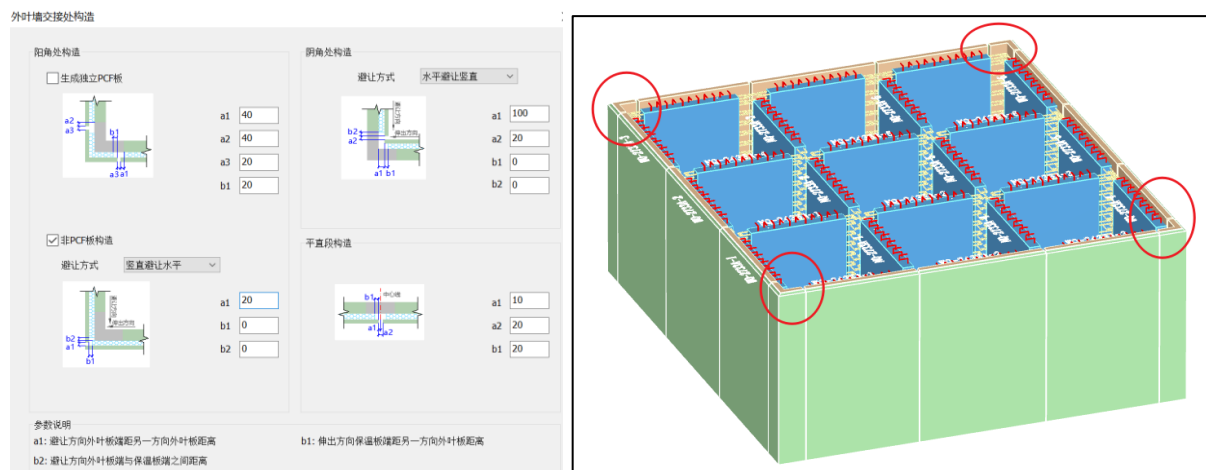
Wall horizontal connection node design in YJK's built-in prefabricated building design software
